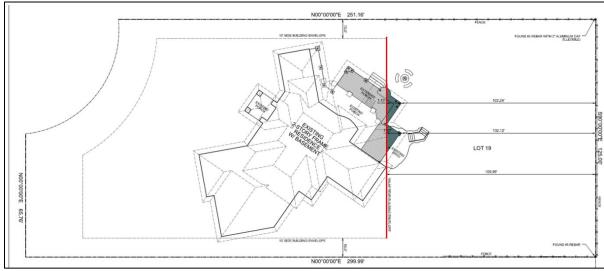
Proposed deck expansion, with the existing rear building envelope line indicated in red; the sections of the proposed deck located outside of the existing building envelope are indicated in green. Note: North is to the right.
